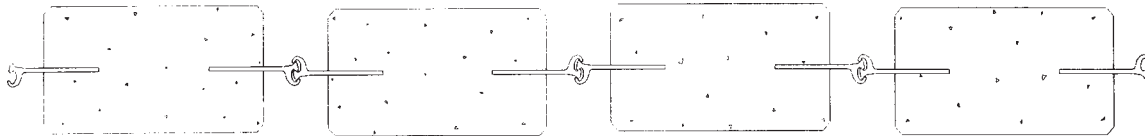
Concrete Sheet Piling with Steel Interlocks
